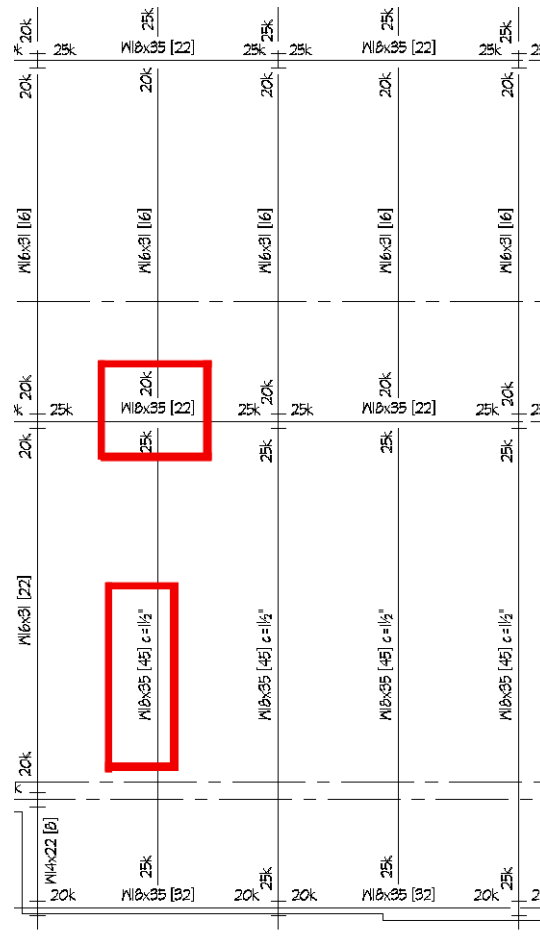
Existing Composite Beams and Girders with Composite Metal Deck
